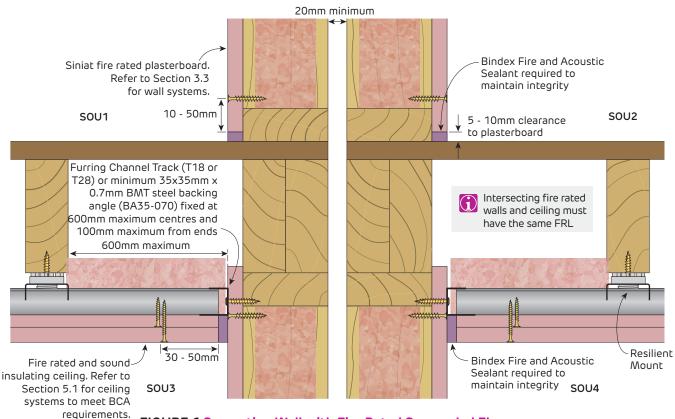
Separating Wall with Fire Rated Suspended Floor $\mathsf{FRL}\,60/60/60$
